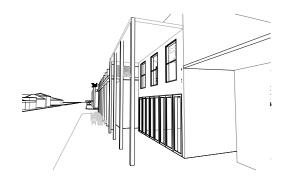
View from Bridge Street footpath looking towards JV building 2 retail
